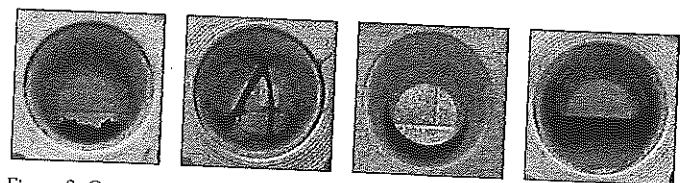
Cross-sections of pipes with obstructions used in the modelling
